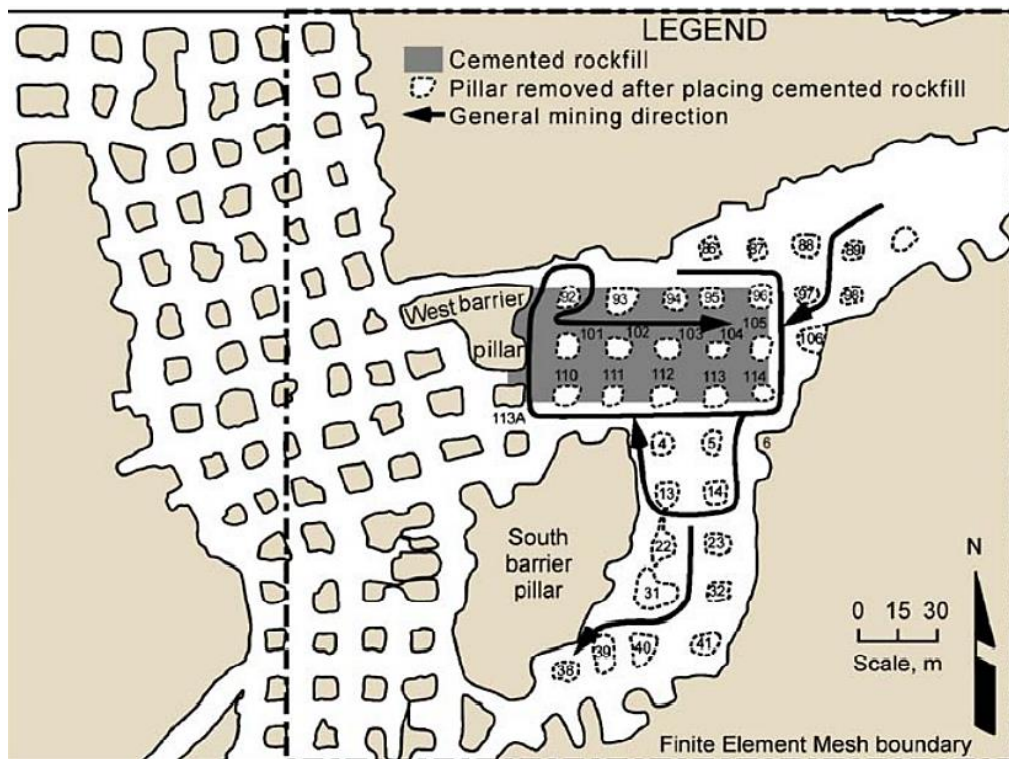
A plan view of Area 5 (after Tesarik et al., 2009).
